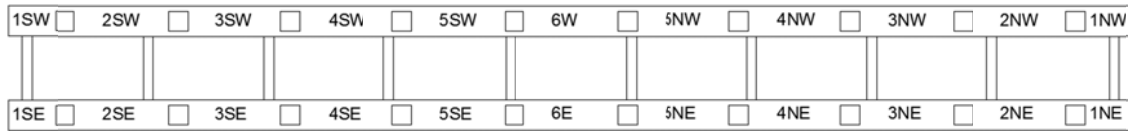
Plan view of the arches, struts, and column pedestals showing the bay labeling scheme
